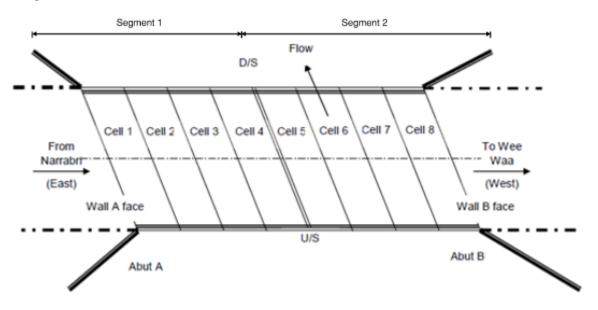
Culvert general arrangement (Source: TfNSW and FBE)
